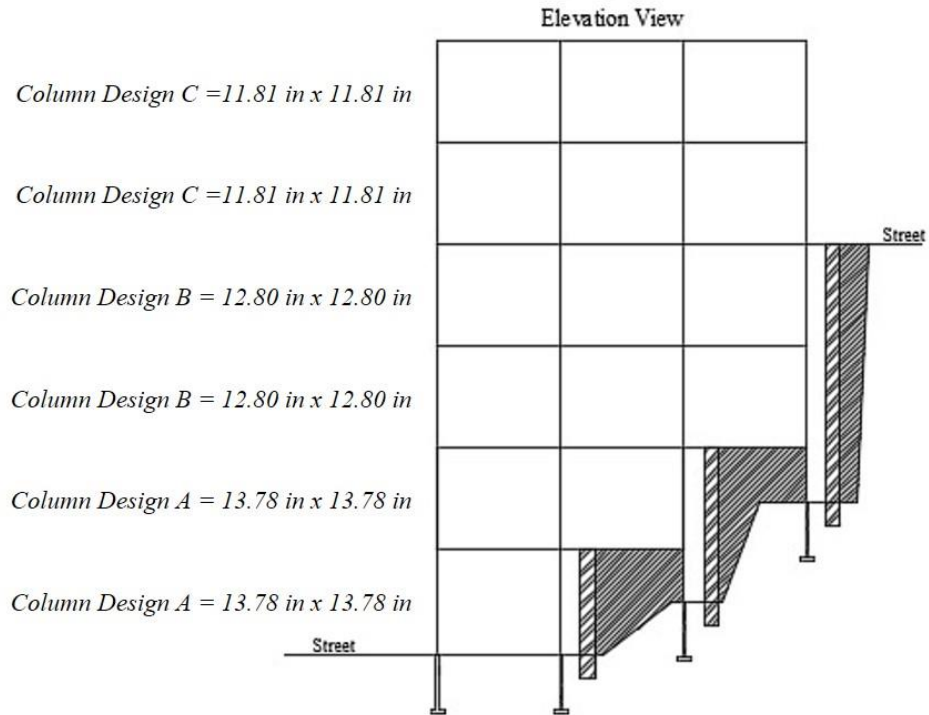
Elevation view of structural variation with different column dimensions at each floor, design ID 6 in Table 2.
